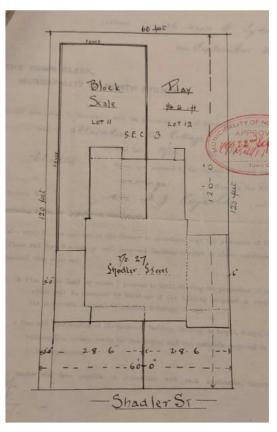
Block plan accompanying building application for alterations to cottage, 21 September 1911. (Source: North Sydney Heritage Centre, Stanton Library, NSCMA 91/5.36, Box 6, Folder R, 1911)
